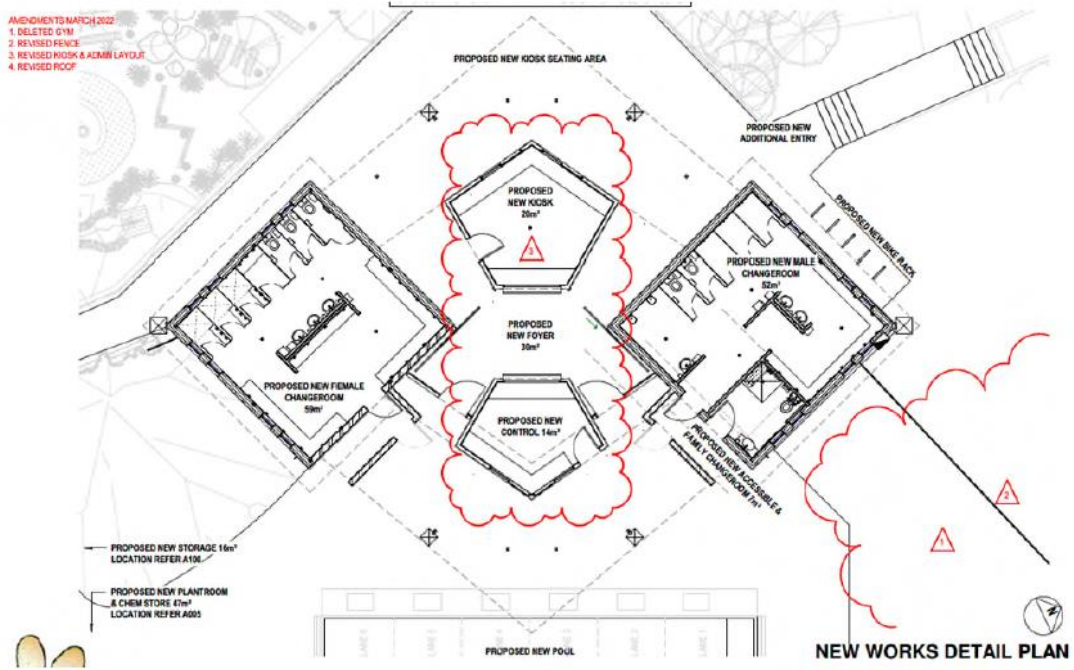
Proposed New Works Detail Plan (Prepared by Paul Barnett Design Group)
